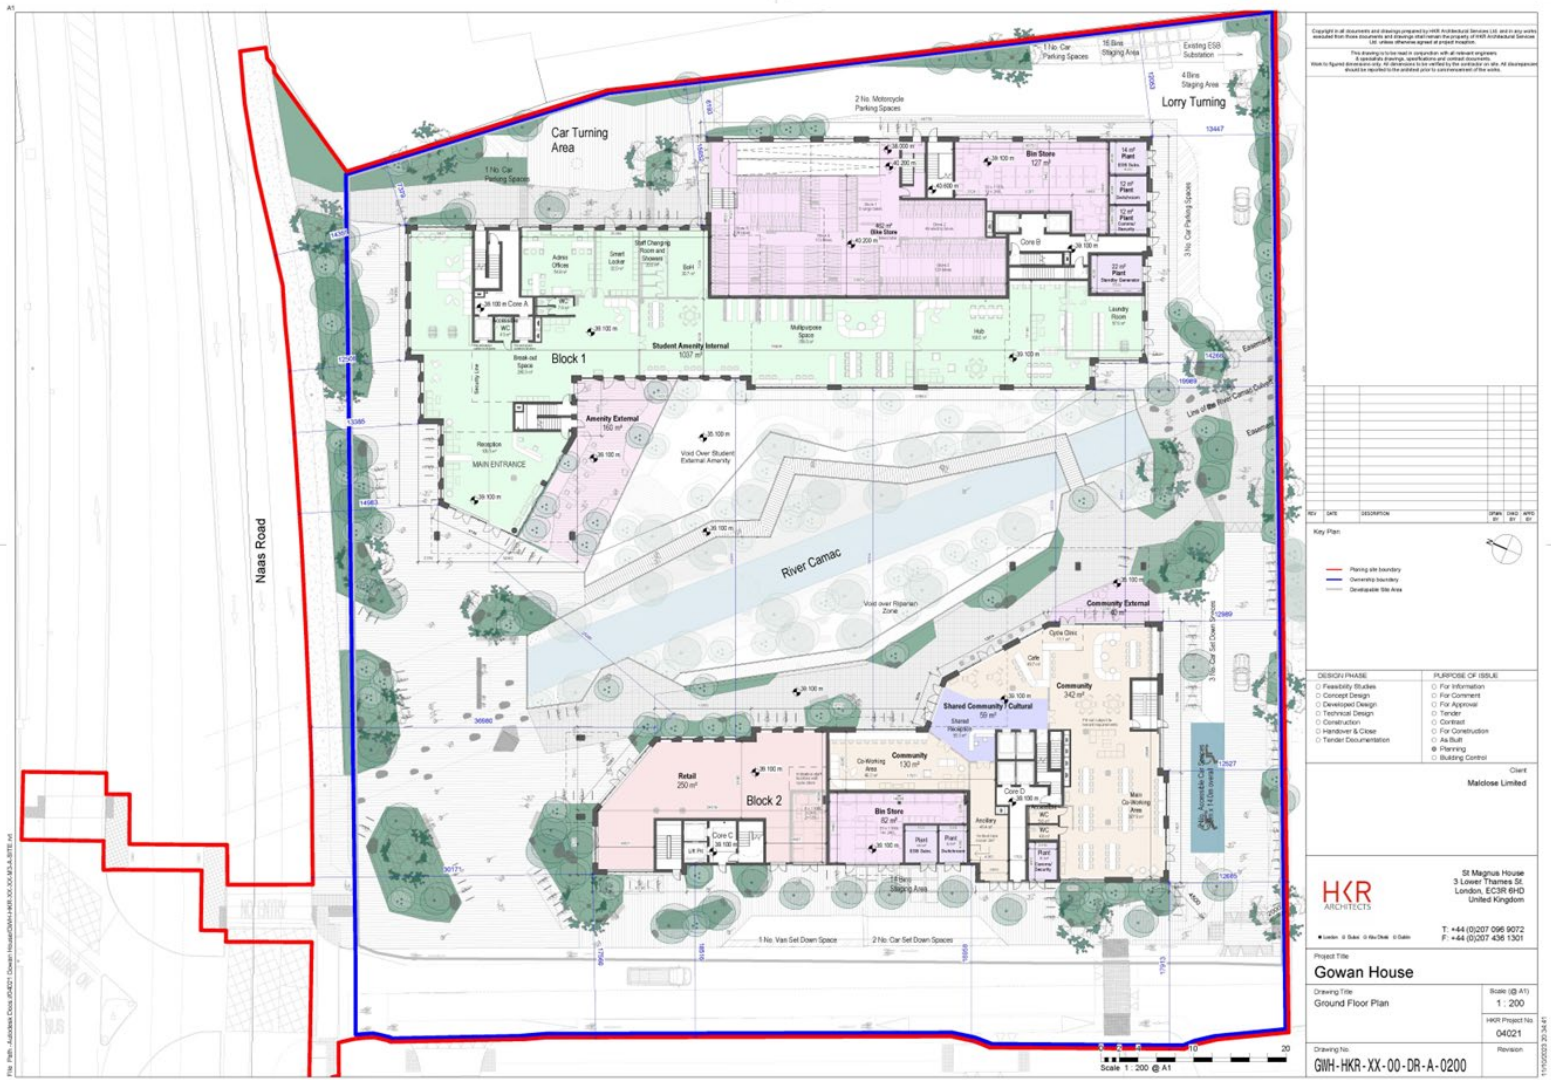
Site Layout (GWH-HKR-XX-00-DR-A-0200, HKR Architects, 2023)
